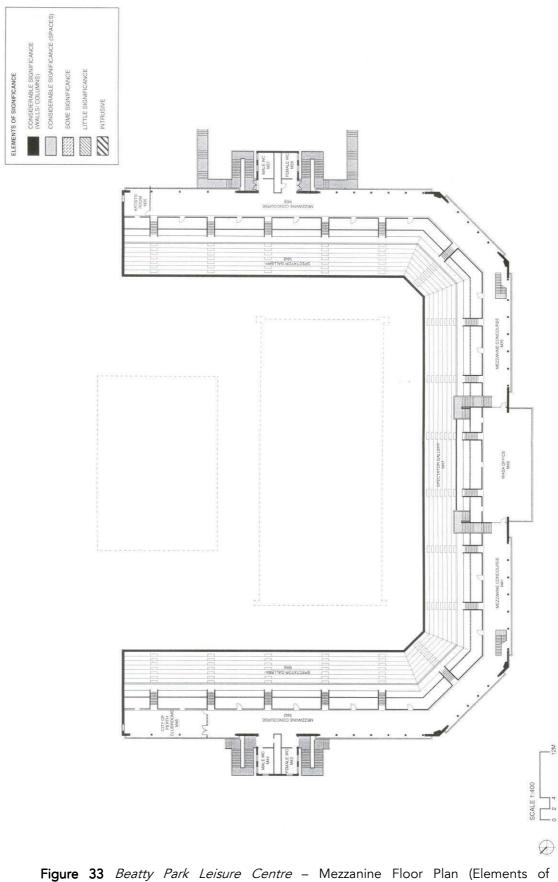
Beatty Park Leisure Centre – Mezzanine Floor Plan (Elements of Significance).
